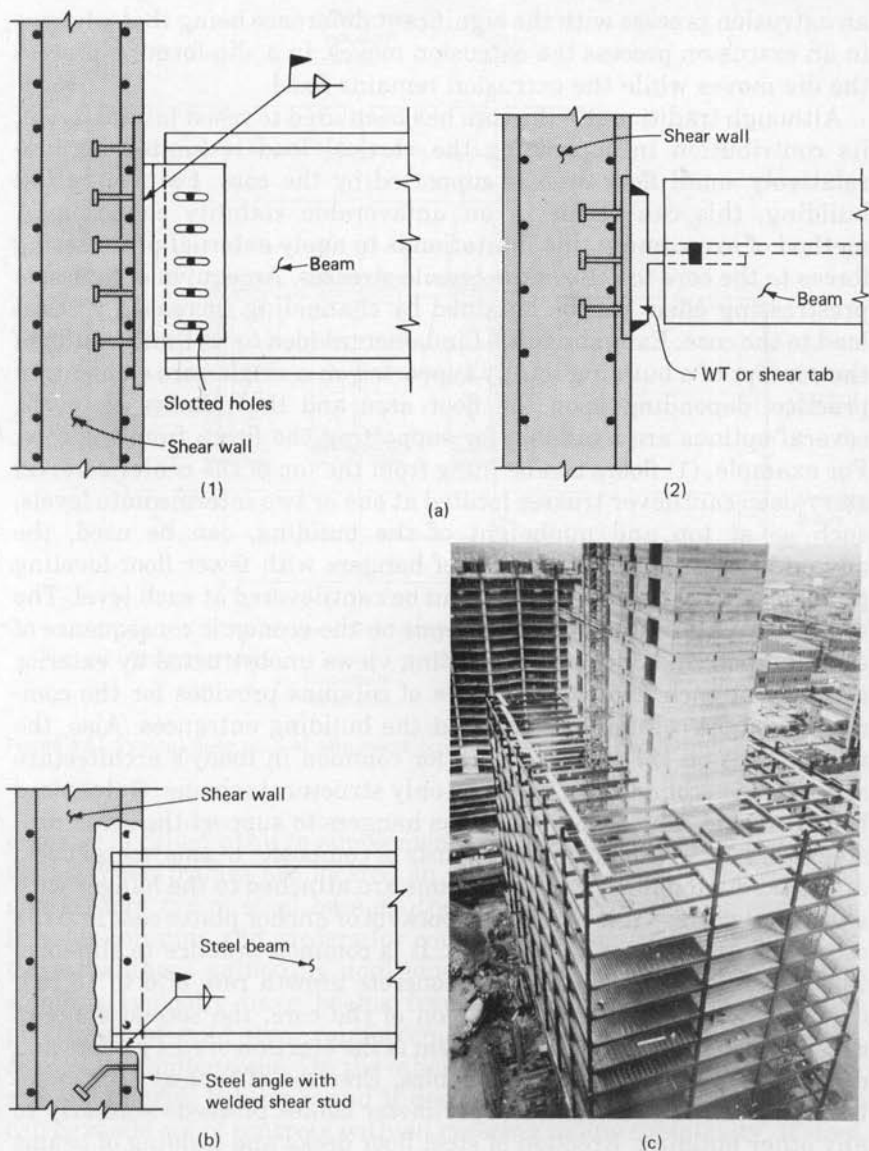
Beam to shear wall connection. (a) Embedded plate detail: (1) elevation; (2) plan; (b) pocket detail; (c) Photograph of composite building with shear core and steel surround.
